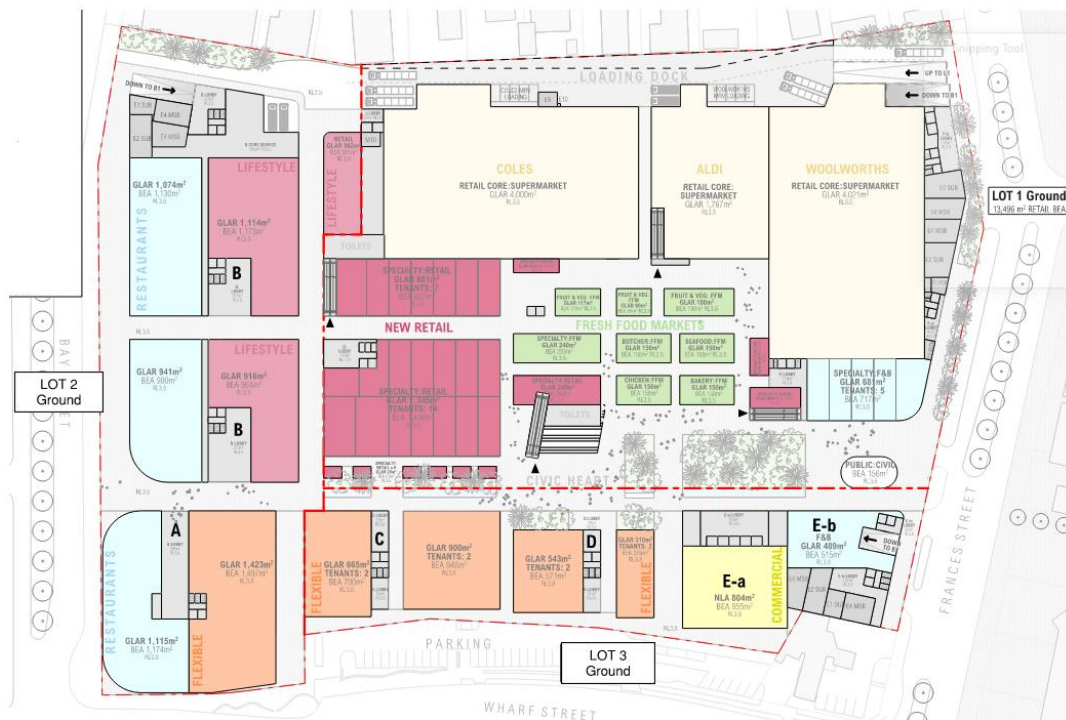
Proposed development ground floor Illustrating Lot sections (adapted from drawing A-DA-103 Revision F).
